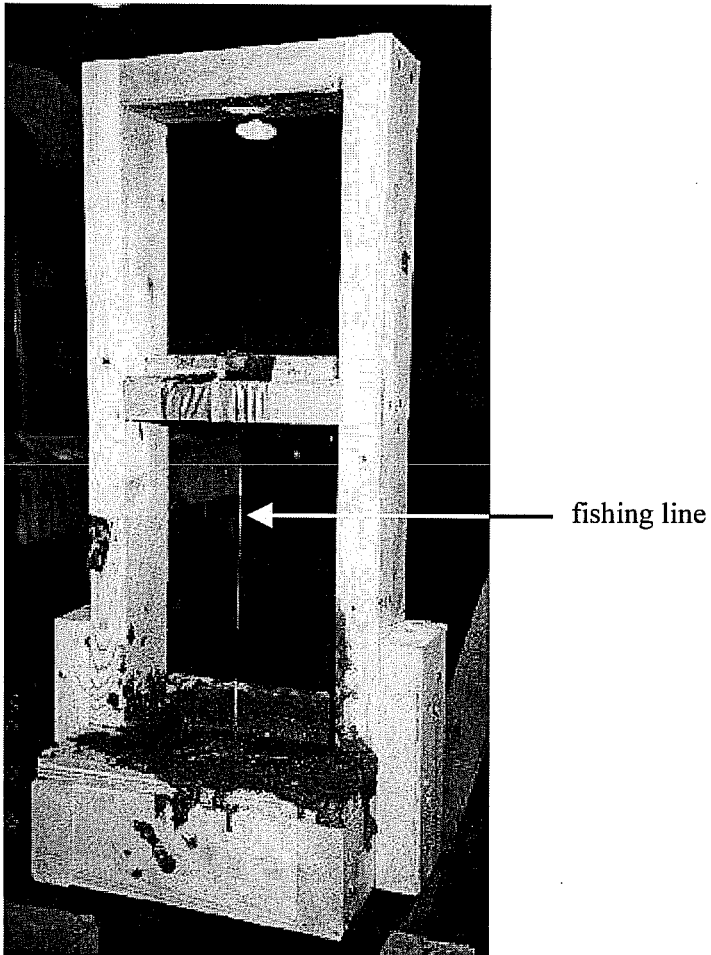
CFT specimen after casting of the concrete had been completed.
